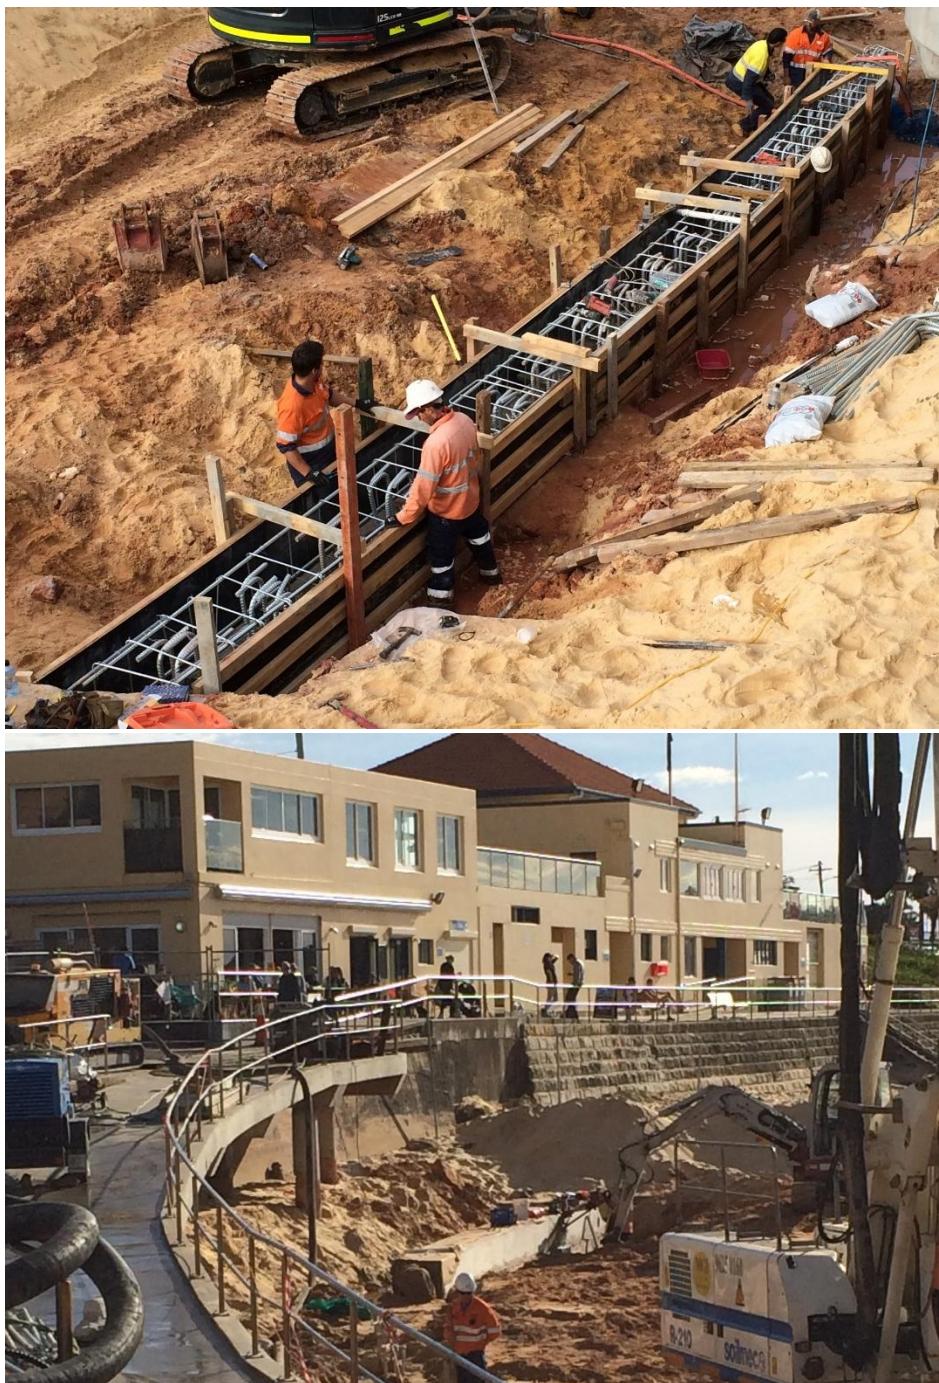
Construction photos during installation of an anchored secant pile wall and capping beam installed at South Curl Curl Beach
